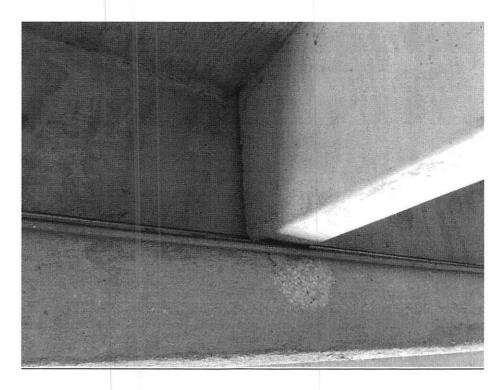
Spalled face of a haunch below a supported joist.
